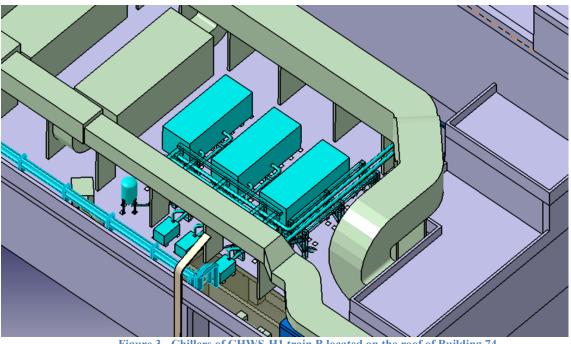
Chillers of CHWS-H1 train B located on the roof of Building 74
